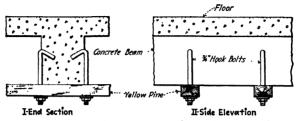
Hook bolts placed into concrete beam for supporting stringers.
